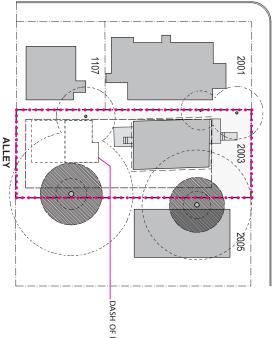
BACK YARD OF EXISTING HOUSE AT 2003 TILLOTSON, PROPOSED SITING OF ADU
